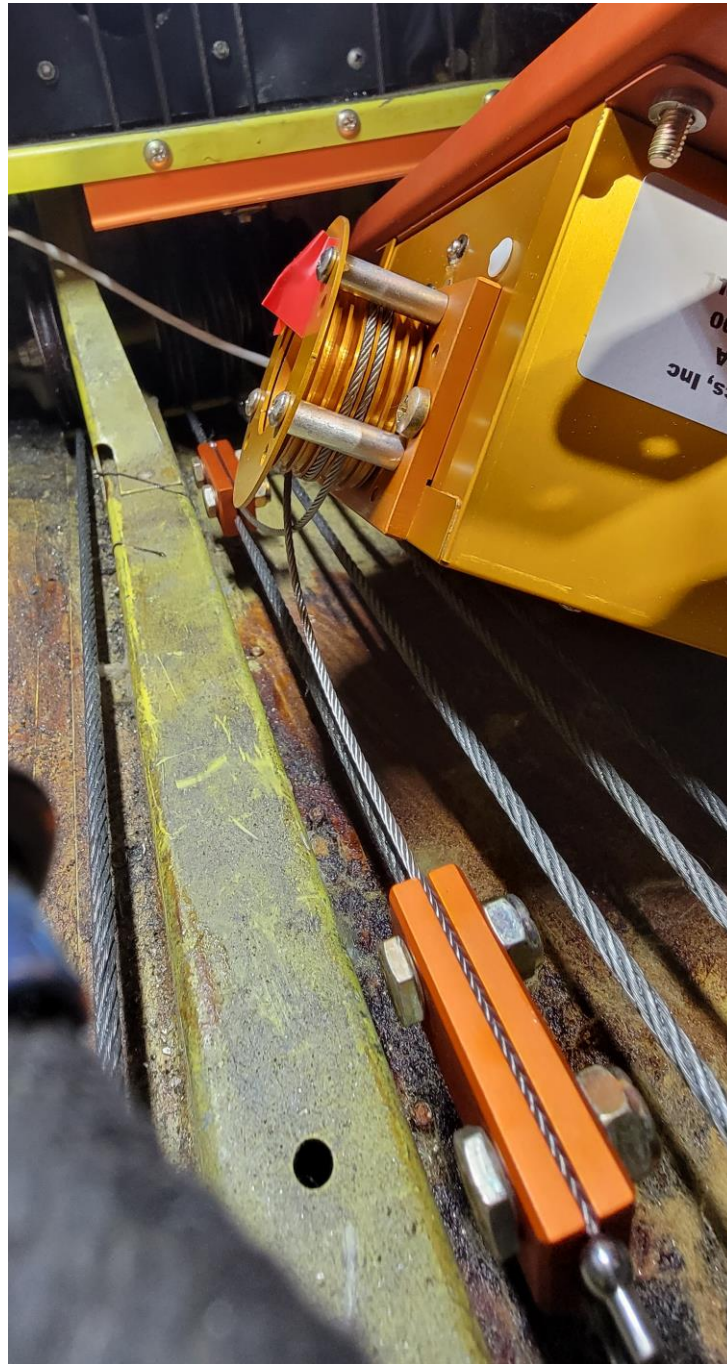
CAPSTAN BRIDLE CABLE REFERENCE
